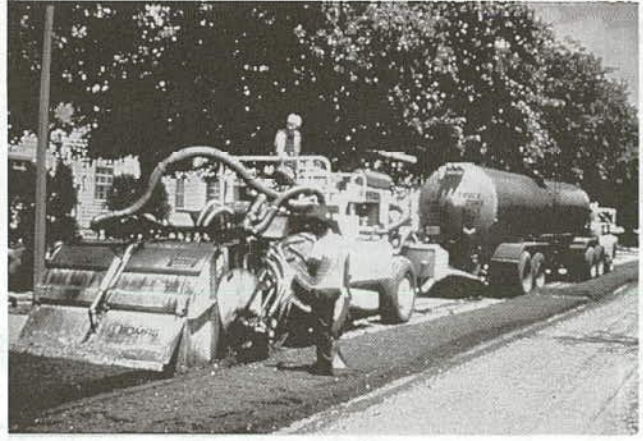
Single-shaft rotary mixer with asphalt supply tank.
